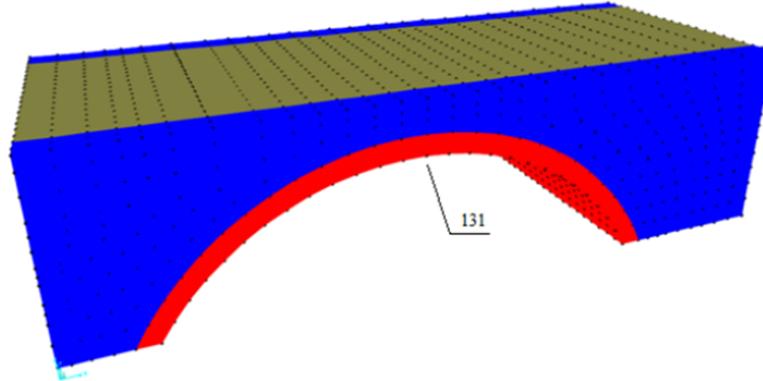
Three dimensional finite element model of the Murat Bey Bridge
